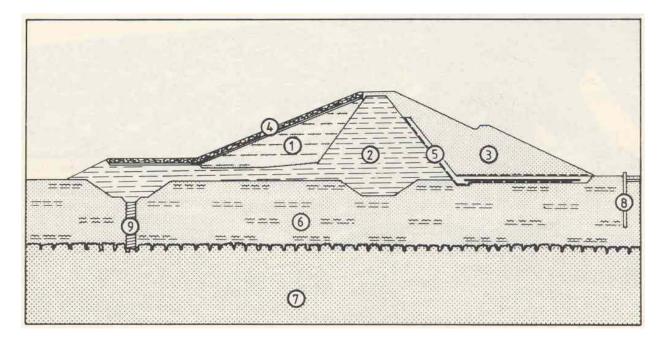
GEOLOGICAL CROSS SECTION AT THE DAM SITE
